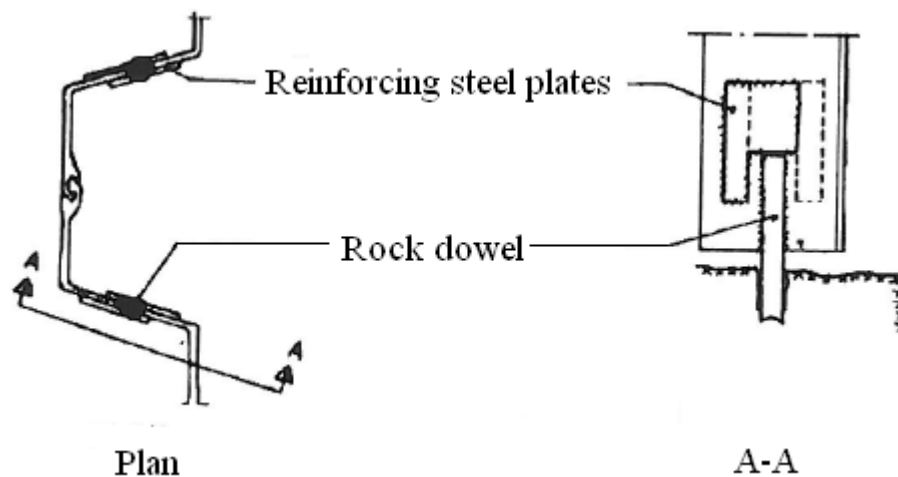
Rock dowel welded to sheet pile. (Jensen, 2008)
